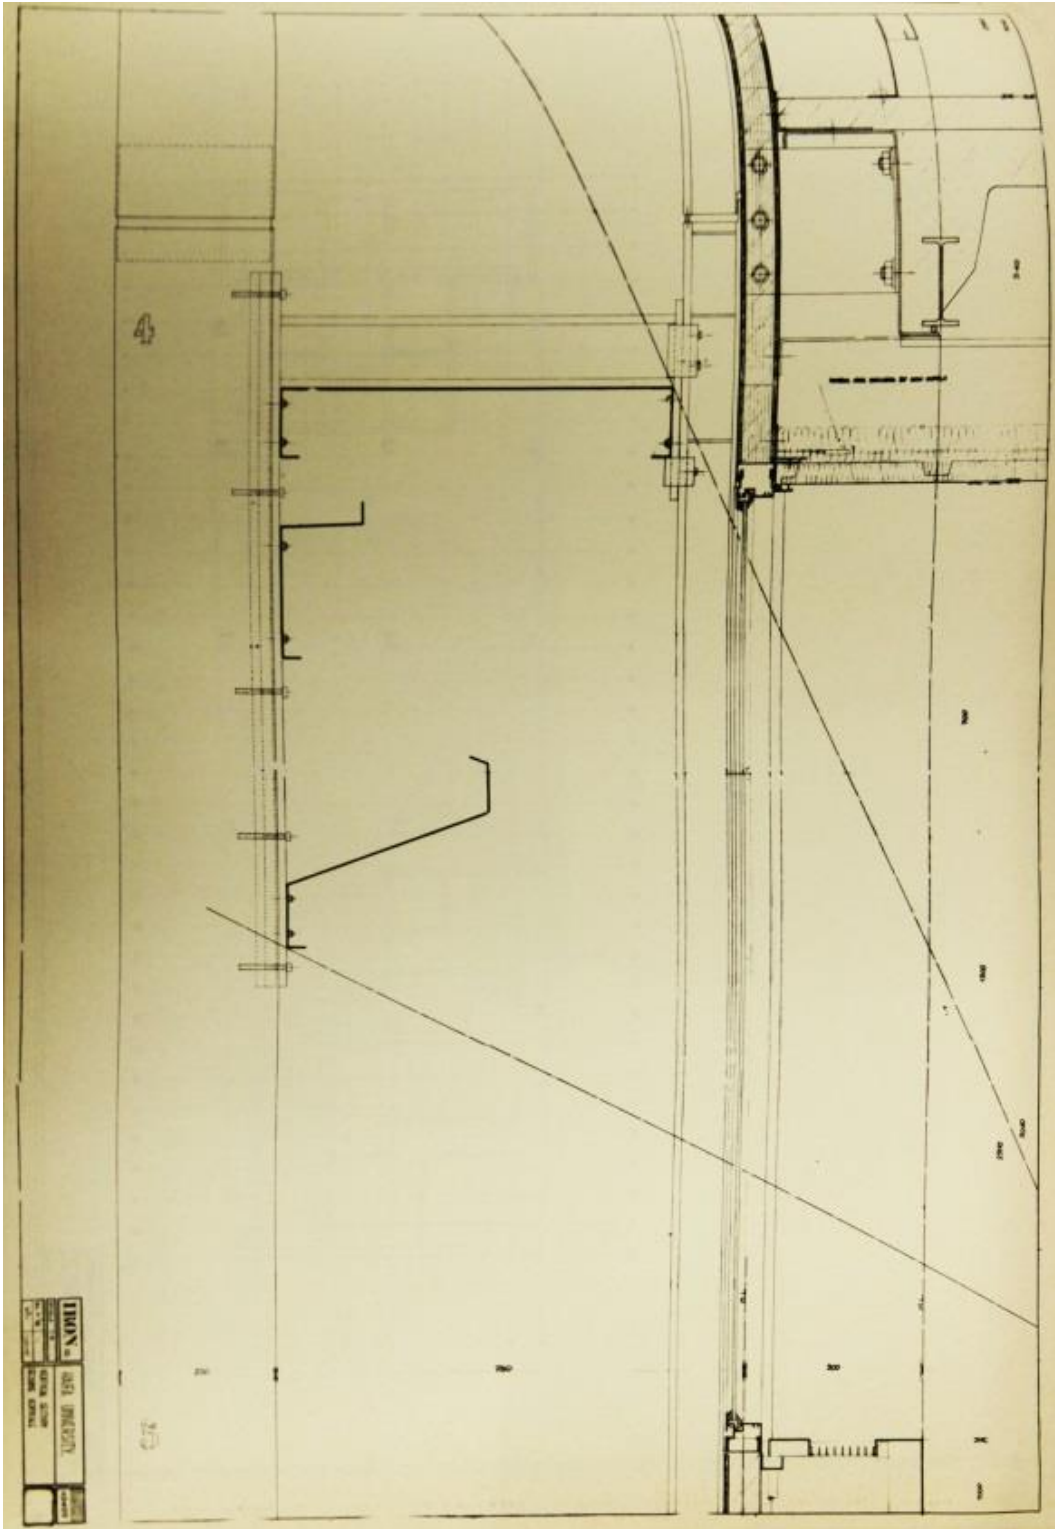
IRON, a vertical cross section of a typical window showing the realized sun breakers system of the Eshkol Tower, as appeared in the March 1974 tender (University of Haifa Archive)
